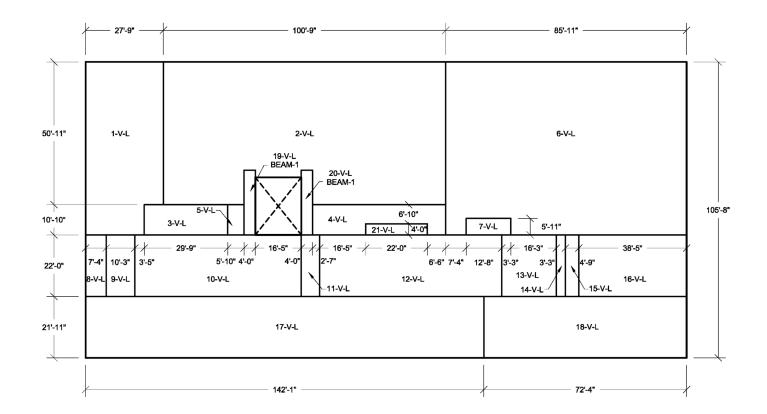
H.3-14 South Wall Looking North Vertical Reinforcement Zones Near Side Face
